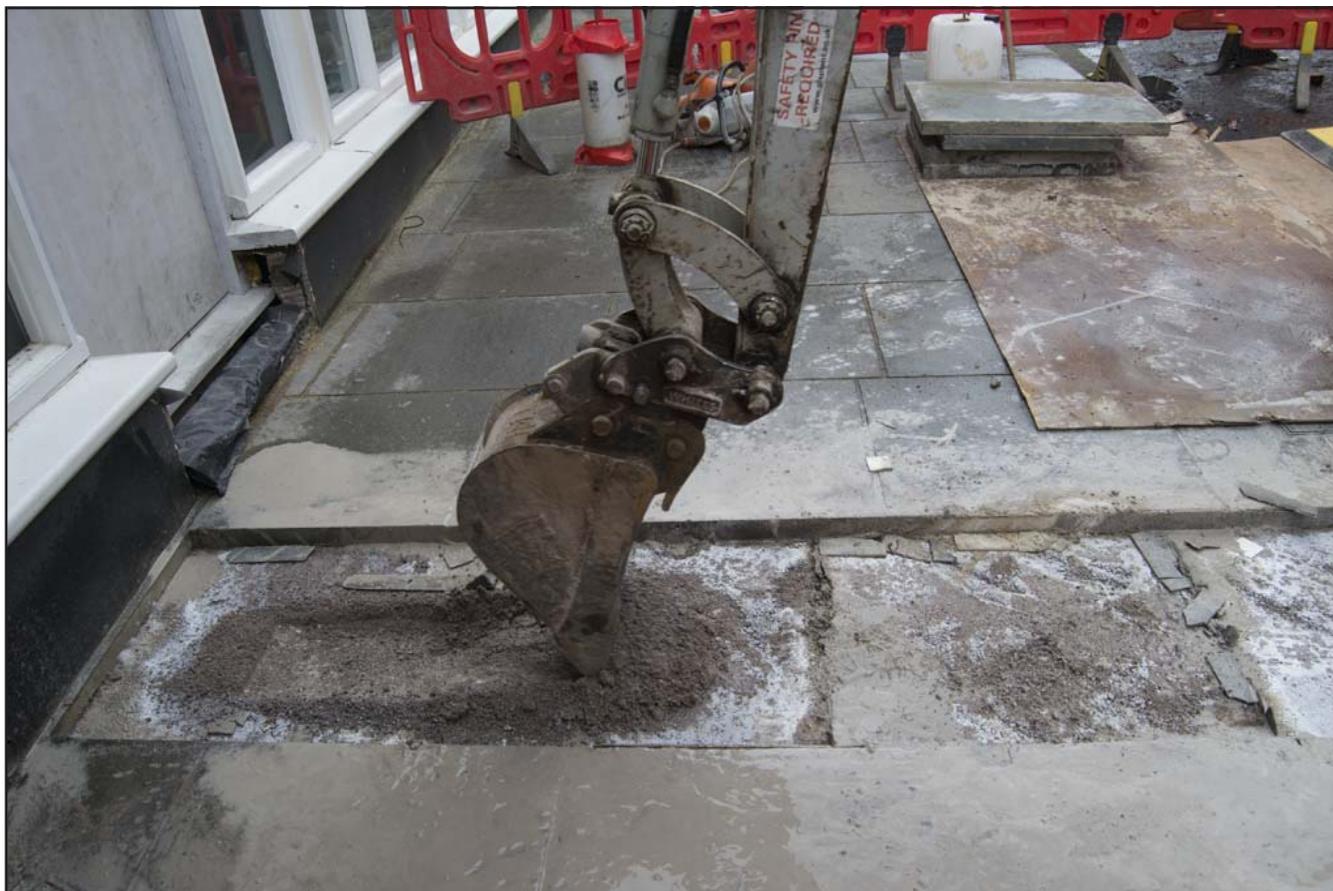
Working shot of excavation of made ground in Trench A using excavator - scale 1x1m; view from W (archive reference: G2775_15).
